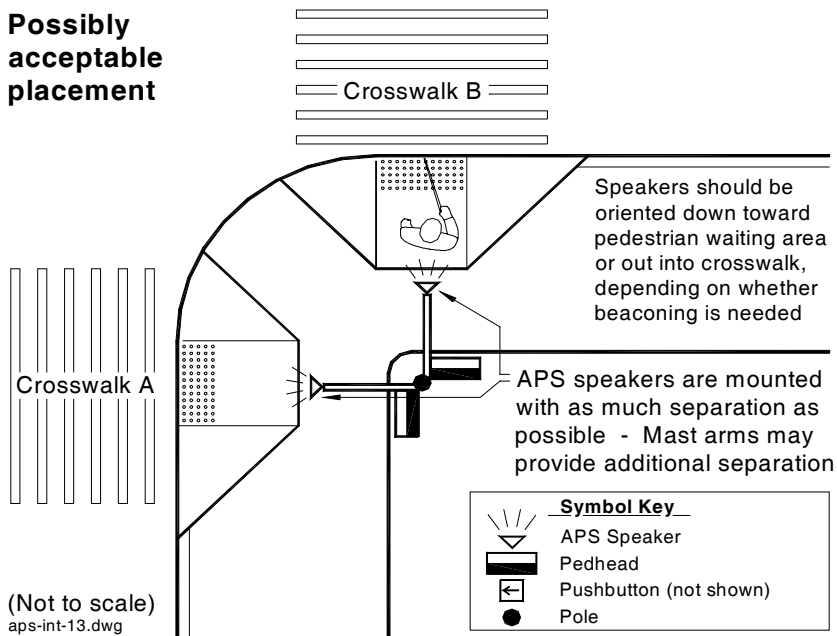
Possibly acceptable placement for pedhead-mounted APS using mast arms to provide additional separation.
